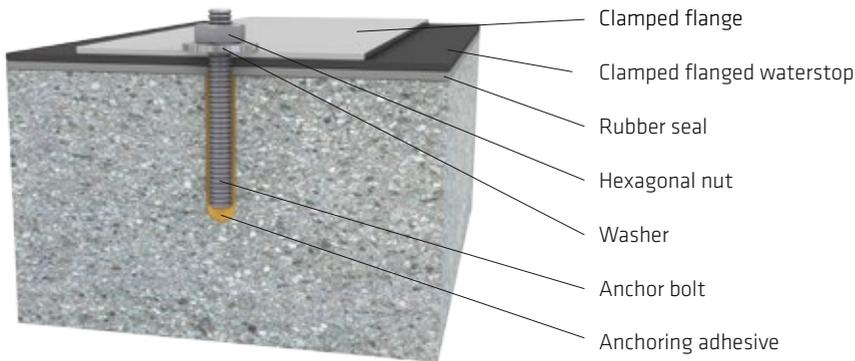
Typical schematic layout of a clamped flange joint seal
